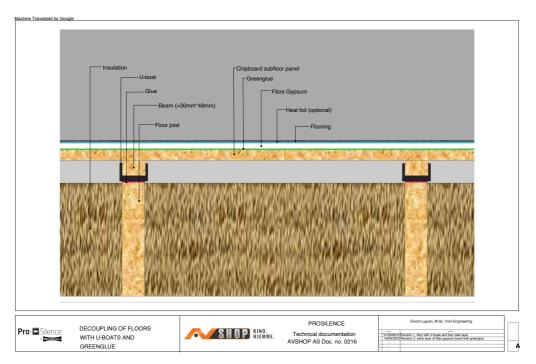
Cross-section of decoupling with level 2 with floor dividers based on wooden beams. It is recommended to glue the U-boats to the joists for practical reasons. For best effect, it is recommended to use two layers of fibre plaster with GreenGlue also on the ceiling on the floor below. This will also help to stiffen the joists.
